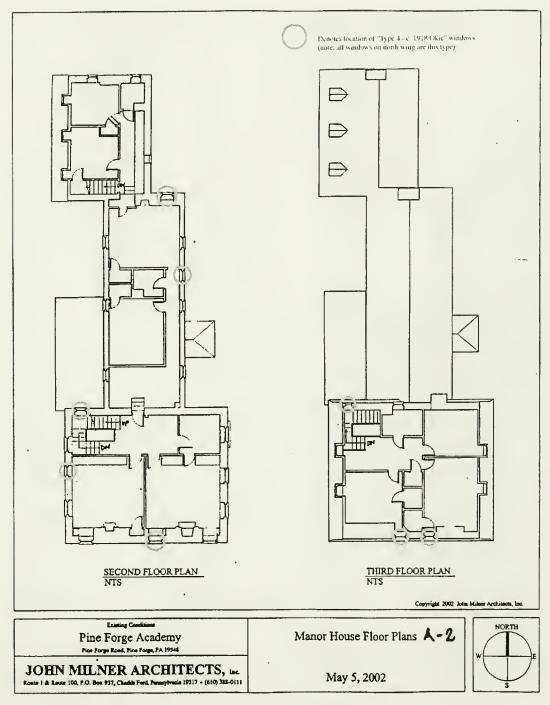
The Center Section and South Wing windows and doors that were altered during c. 1918 Okie renovation are highlighted
